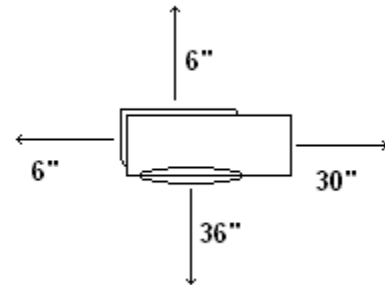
Air-Cooled Condenser Minimum Clearances Plan View
